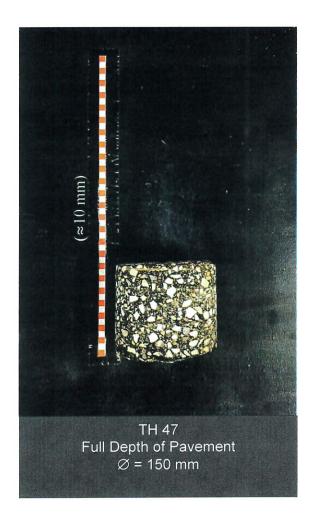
Specimen from Dugald Road, Eastbound Shoulder
